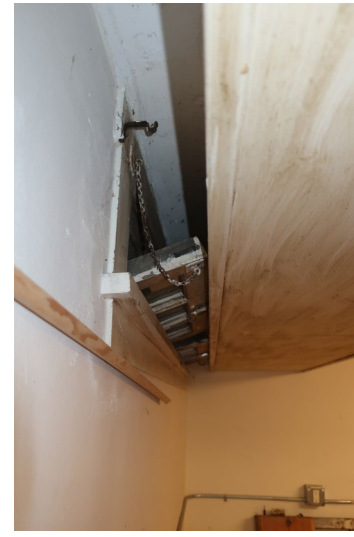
Detail of formerly operable panels under the large east window flower box in the Living Room above.
